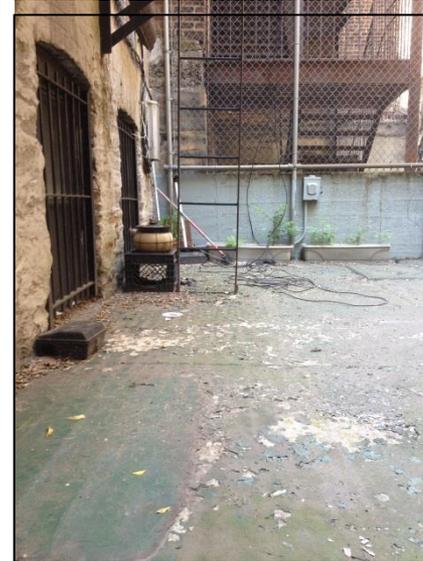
Floor drain in basement of 143 West 108<sup>th</sup> Street.
